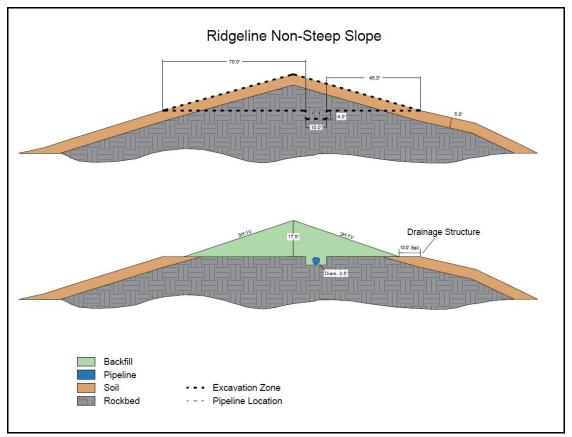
Ridgeline – Non-Steep Typical Cross-section
